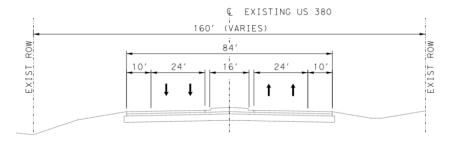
Existing Roadway Typical Section - County Road 26 to Lovers Lane
